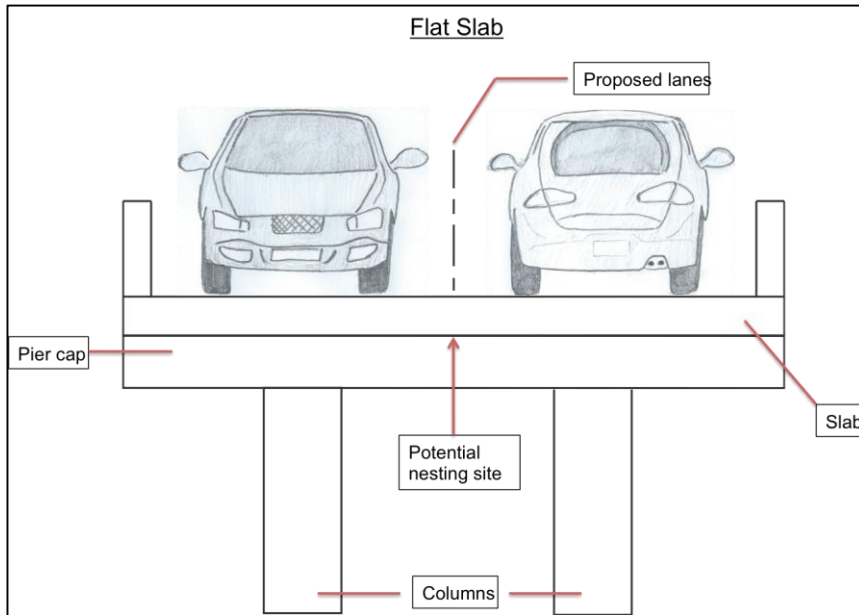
Cross-section view of a flat slab bridge design with potential nesting sites
